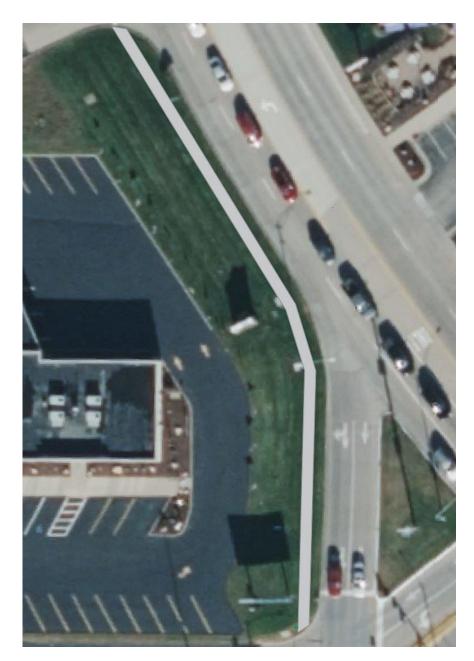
New Sidewalk Between Stoneman Rd and Wacker Dr
